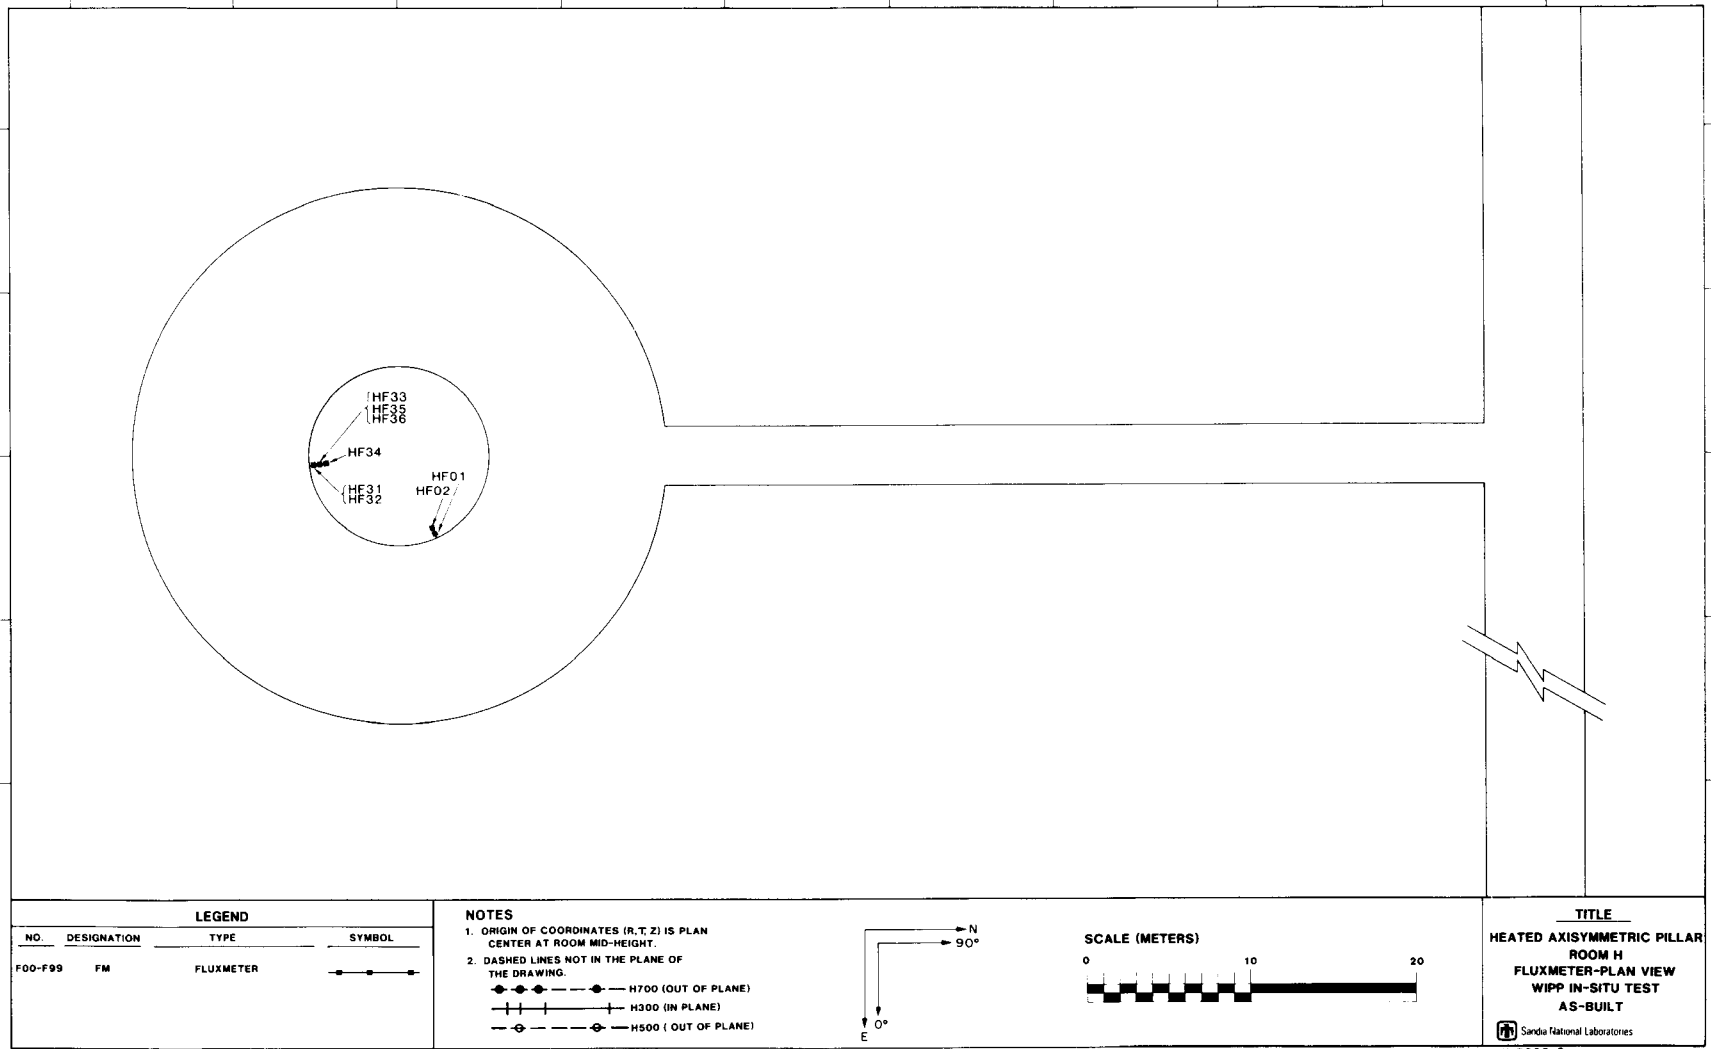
Plan Locations of Flux Meters in Room H
